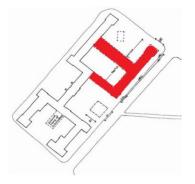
Wings that could be demolished (dotted lines), and the allowed new constructions for the apartment plans (in red)
